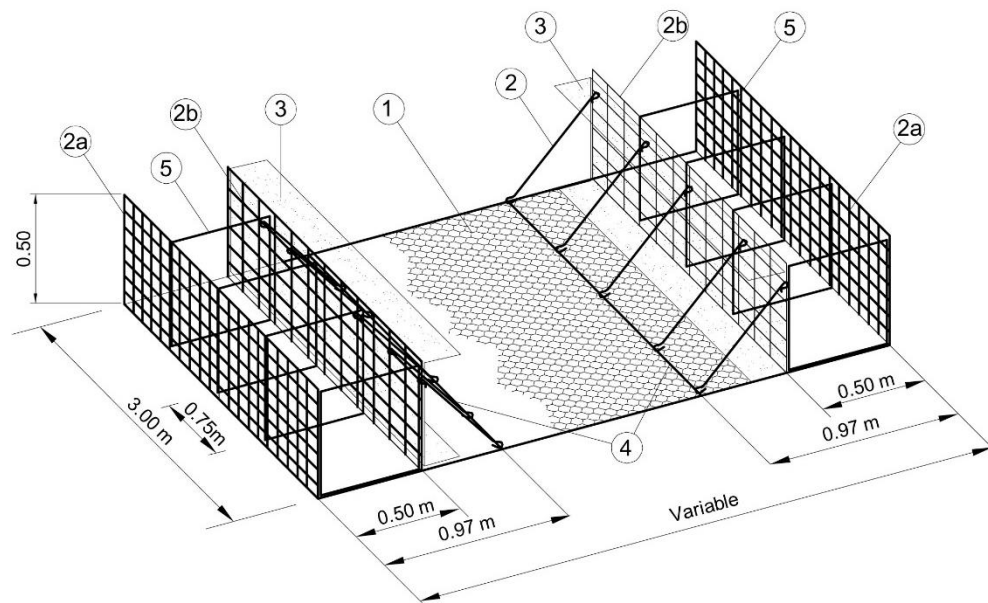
Example of steel reinforcement with facing unit type II – with external welded panel
